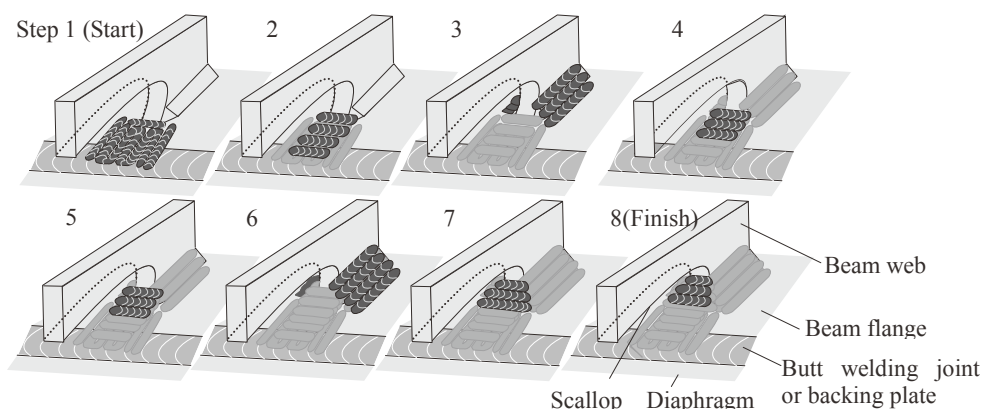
Welding pass sequence of the overlay welding method around toes of scallops (Same as Fig.2.9)
